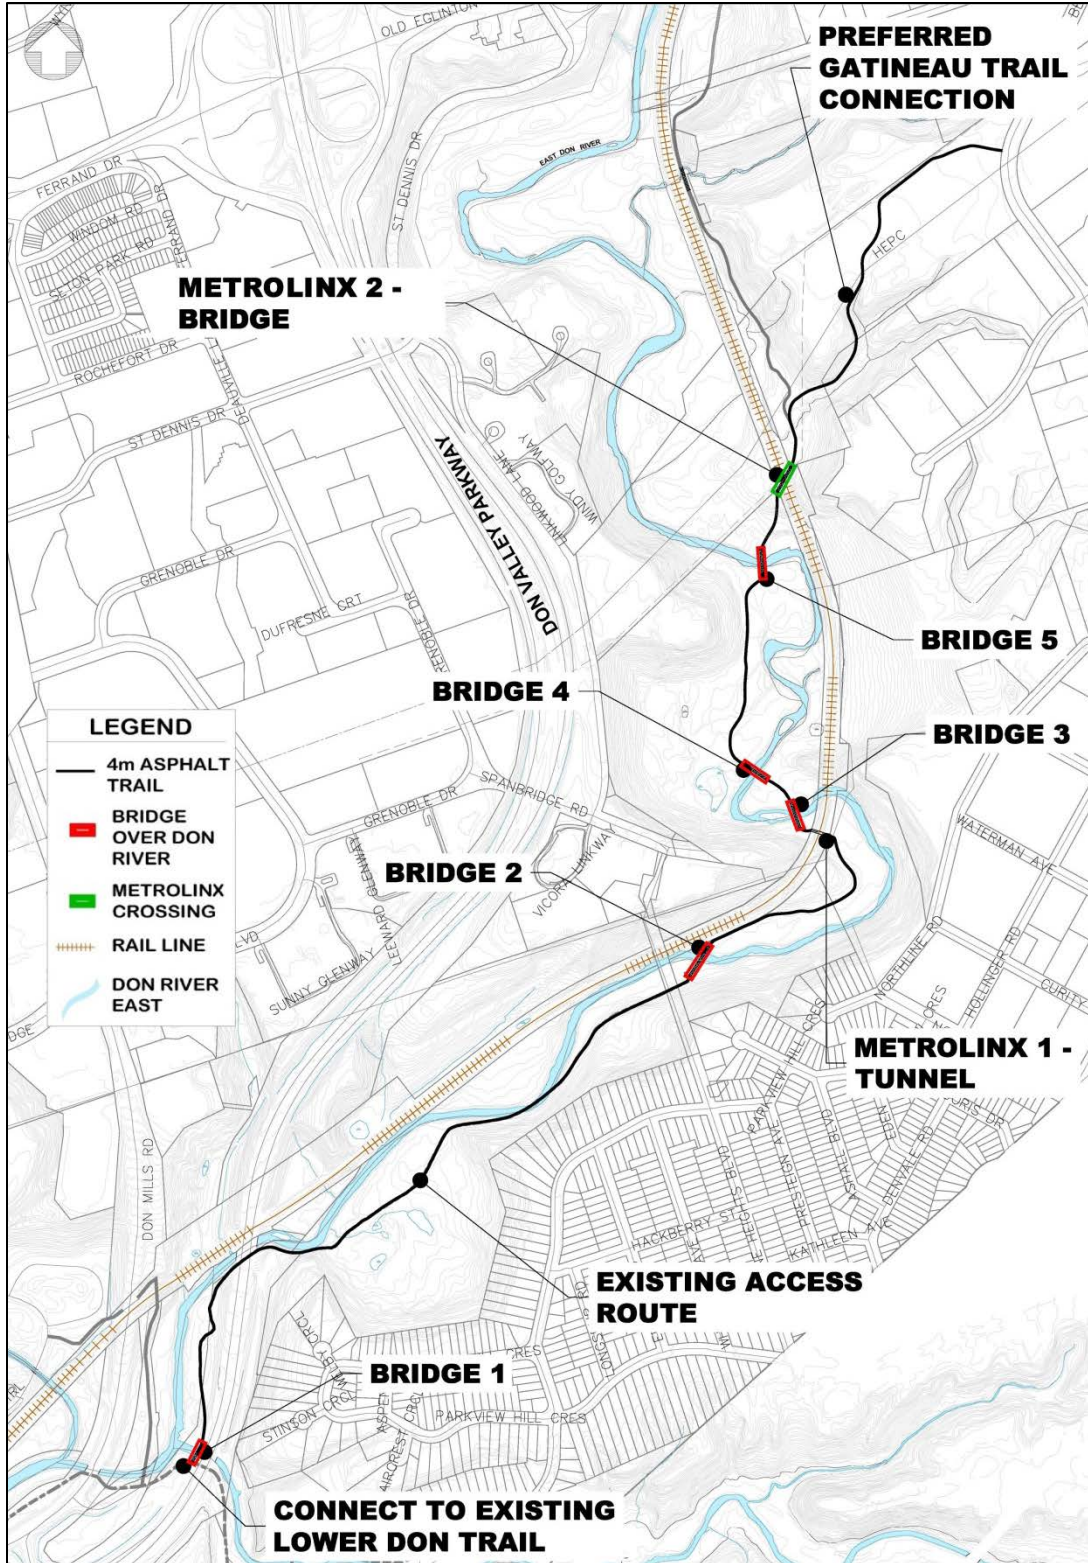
Extent of Phase 1 construction – from Lower Don Trail to Bermondsey Road
